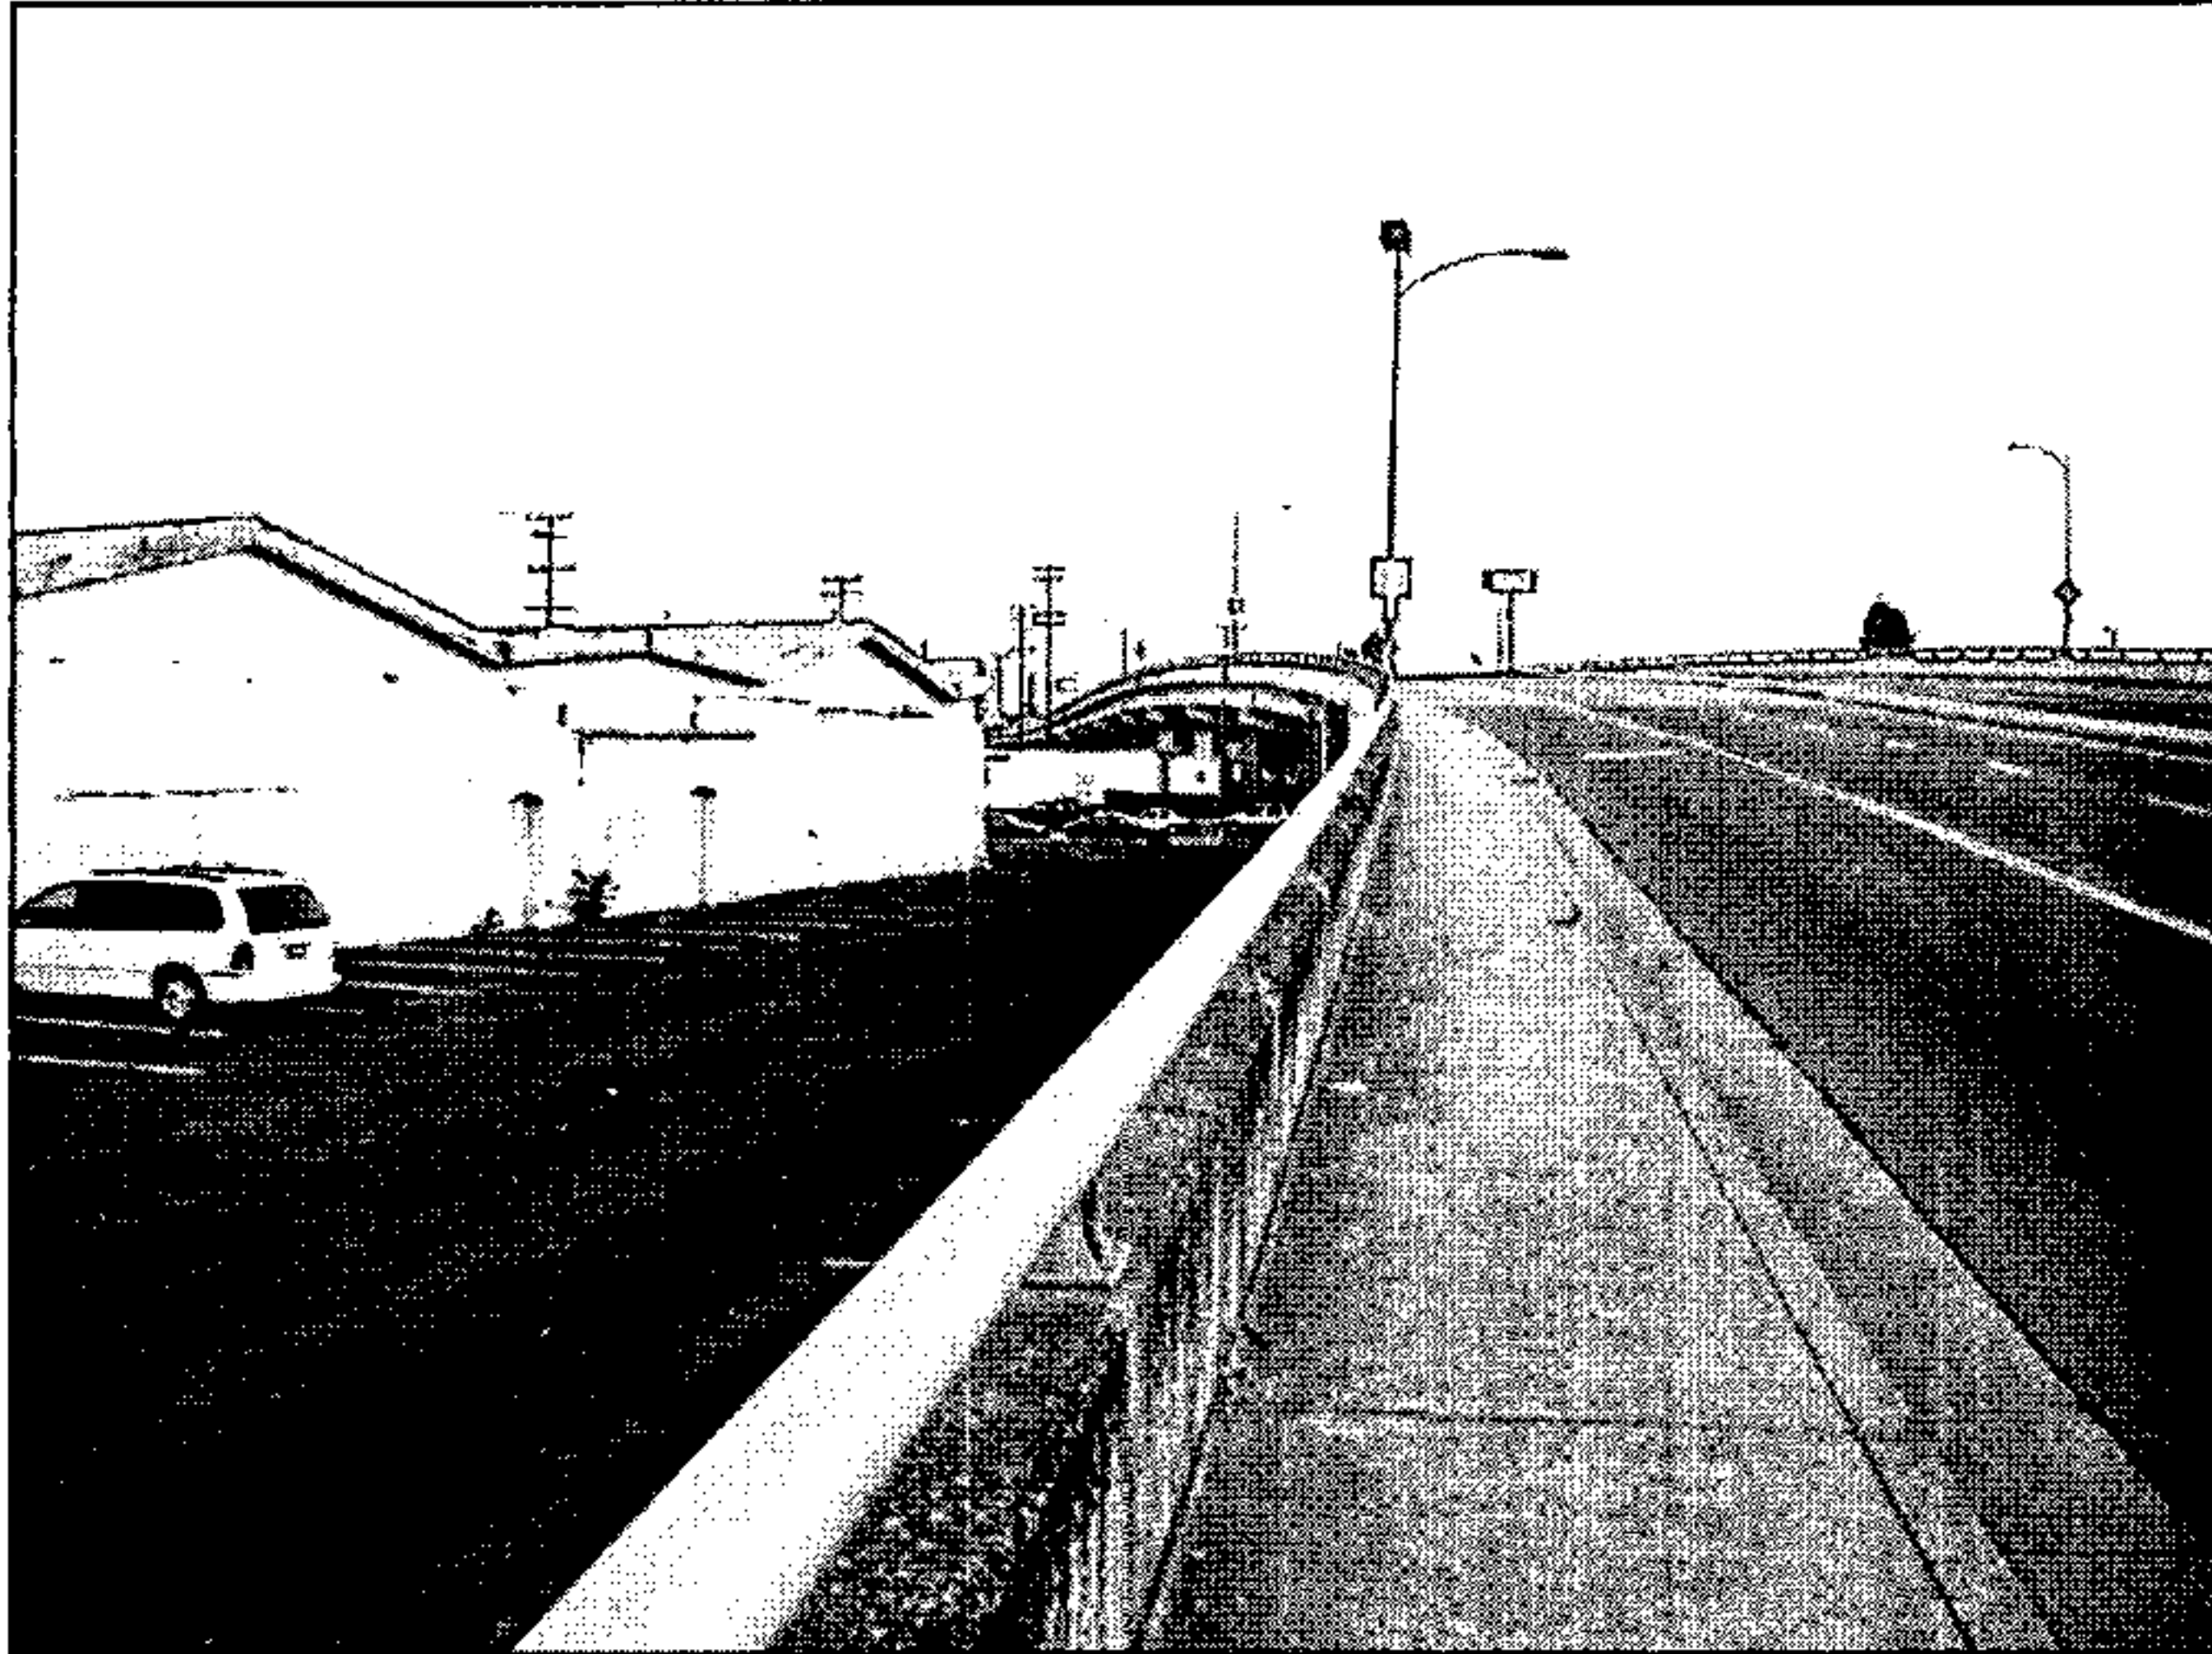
View of Market Street/Coleman Avenue Overpass, Looking North
